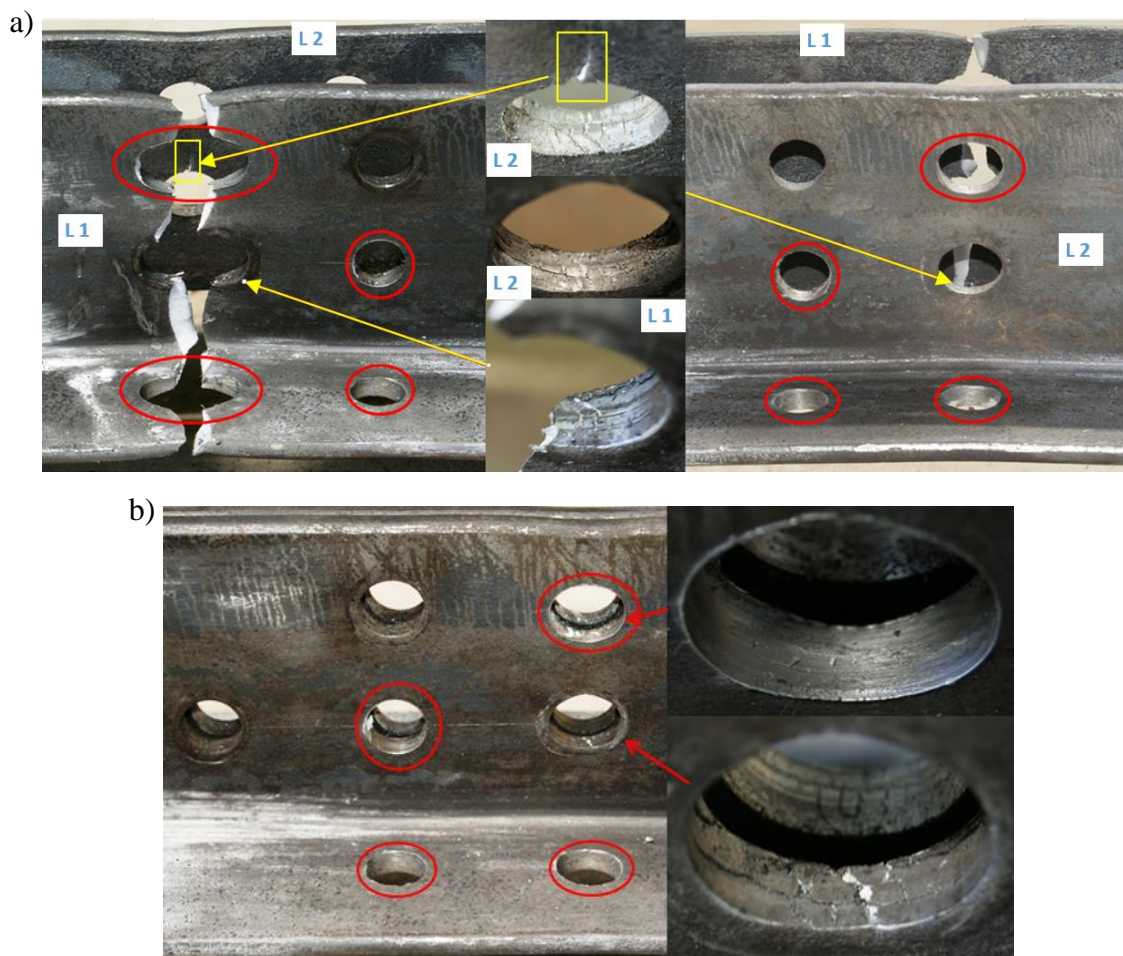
Specimen No. 6 - Observed behaviour: a) top connection after test; b) bottom connection after test
